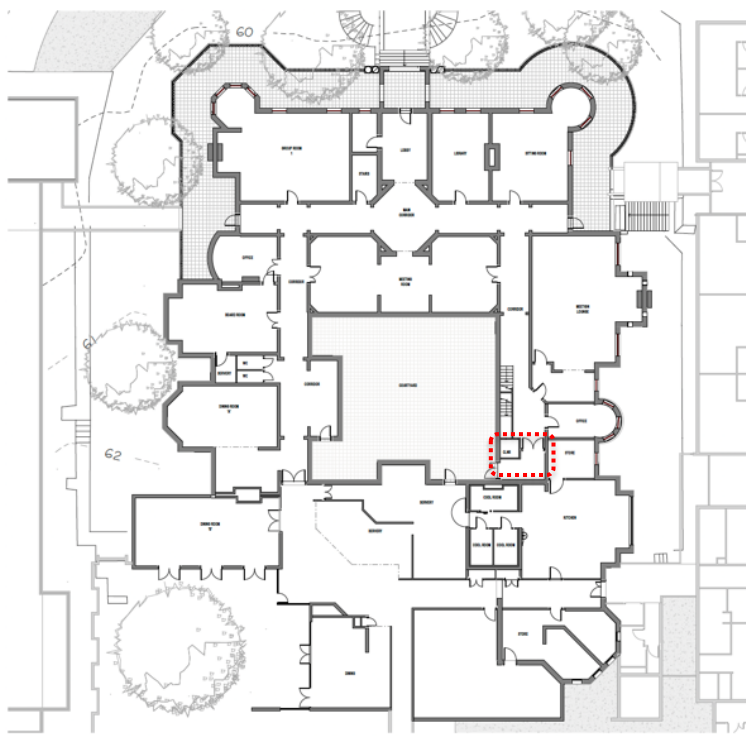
EXISTING GROUND FLOOR PLAN. Corridor space outlined in red.
